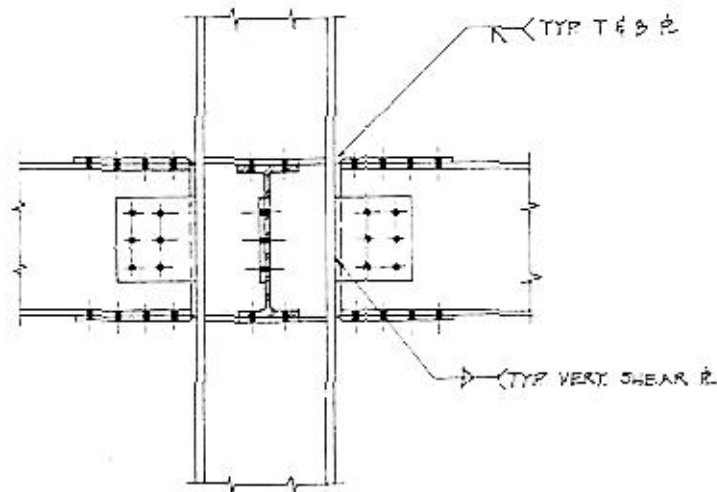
Welded and Bolted Moment Connection, 1950-1960
